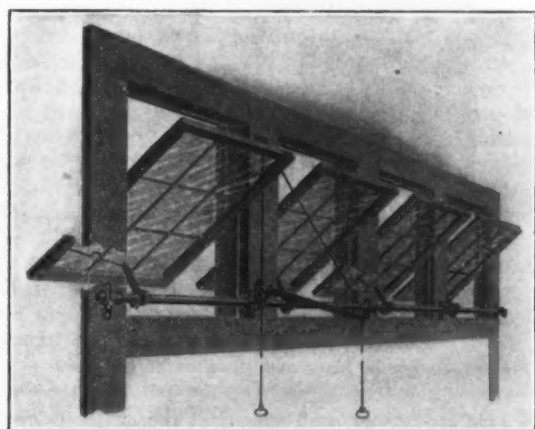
Harris Geared Operator No. 2 for Gangs of Windows.
